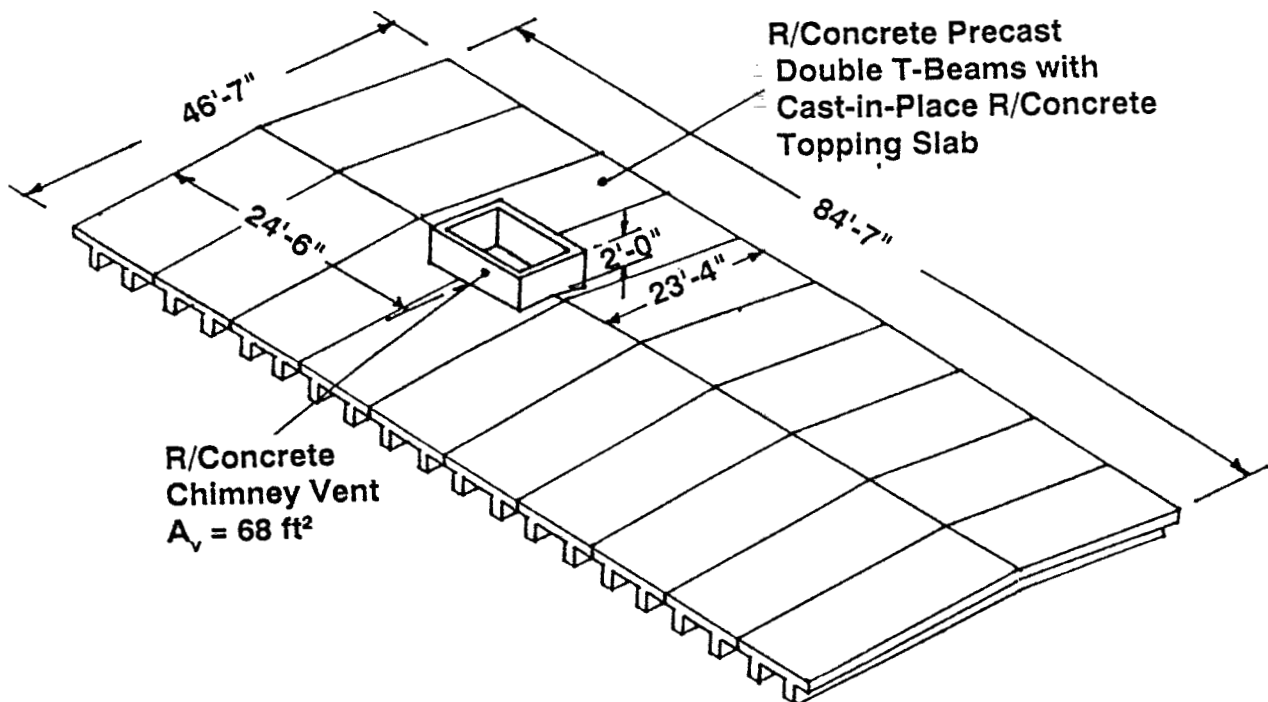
Conceptual design of new roof and chimney for Building 35 - precast R/concrete T-beams with cast-in-place topping slab.
